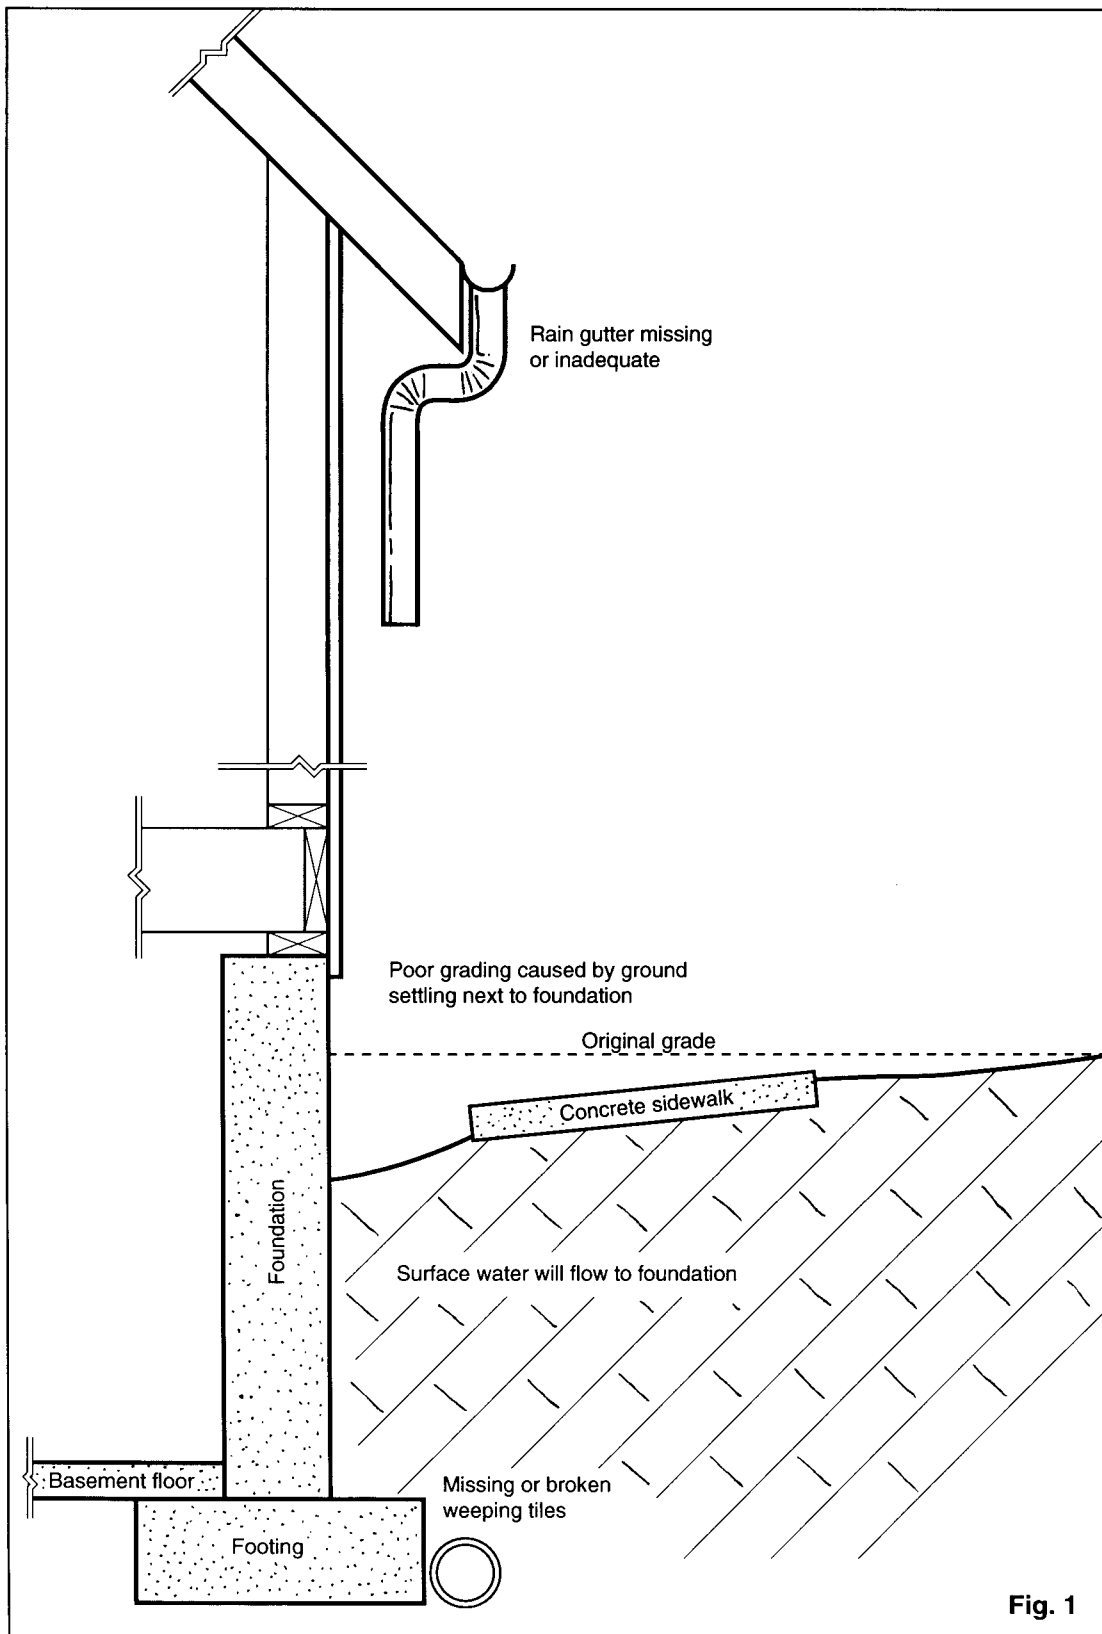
Here is an example of poor drainage around a house. With no extensions on the down spout, all runoff from the roof will be deposited right at the foundation wall. The land around the house has settled, causing all rain and snow melt to flow toward the house rather than away from it. Water will run down the foundation wall and eventually into the basement.
